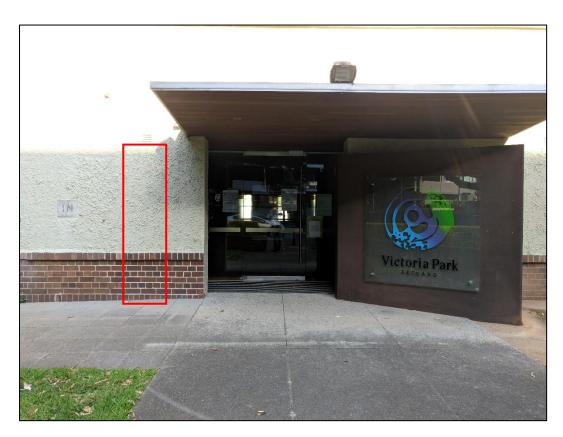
The primary Joynton Avenue entry to the site including location of proposed freestanding pillar sign.
